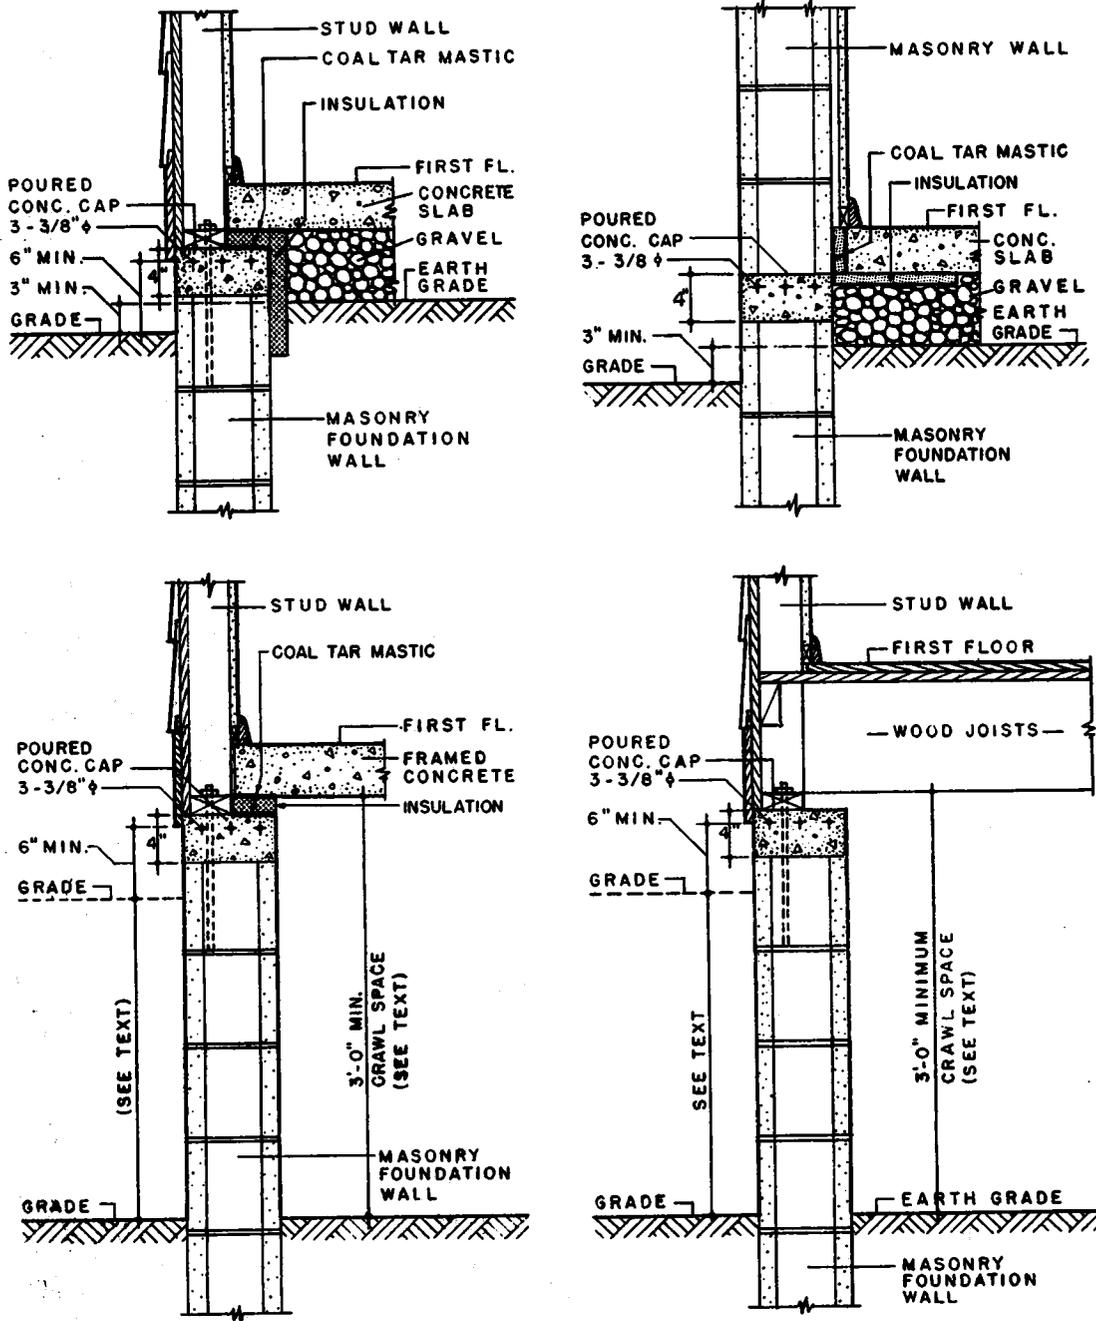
FIGURE I WALL CONSTRUCTION DETAILS FOR TERMITE CONTROL
